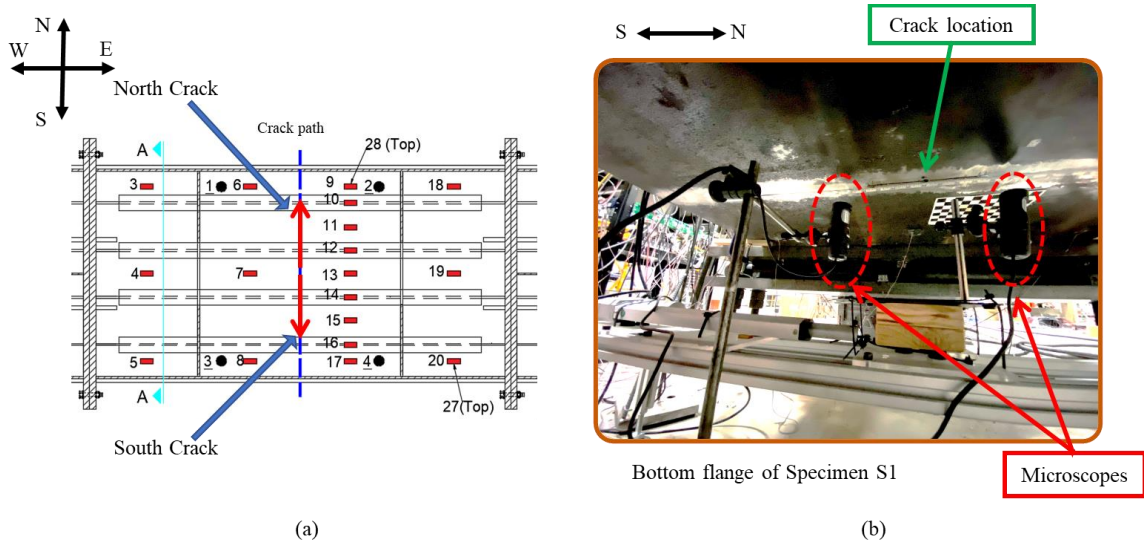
Locations of the cracks and microscopes on the bottom flange of Specimen S1
